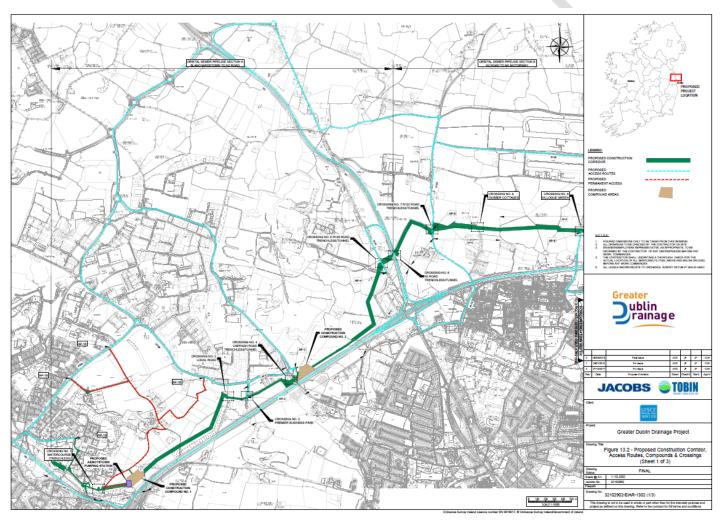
Proposed Construction Corridor, Access Routes, Compounds & Crossings, Sheet (1-3)
